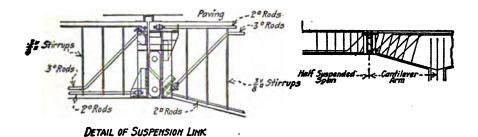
Reinforced Concrete Cantilever Bridge. Colfax-Larimer Viaduct, Denver, Colorado.
